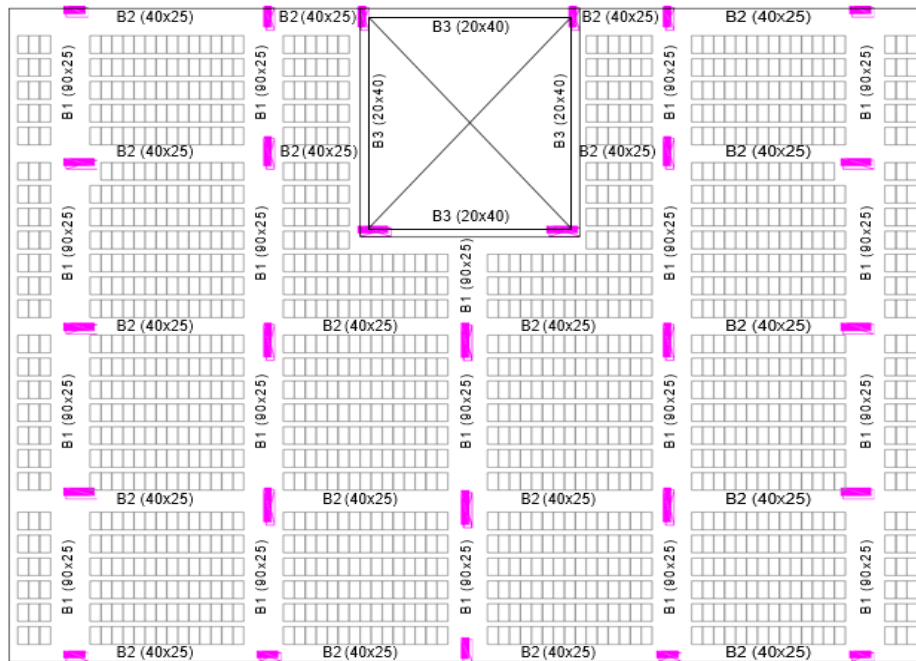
Beams arrangement and dimensions for earthquake resistant building-2
